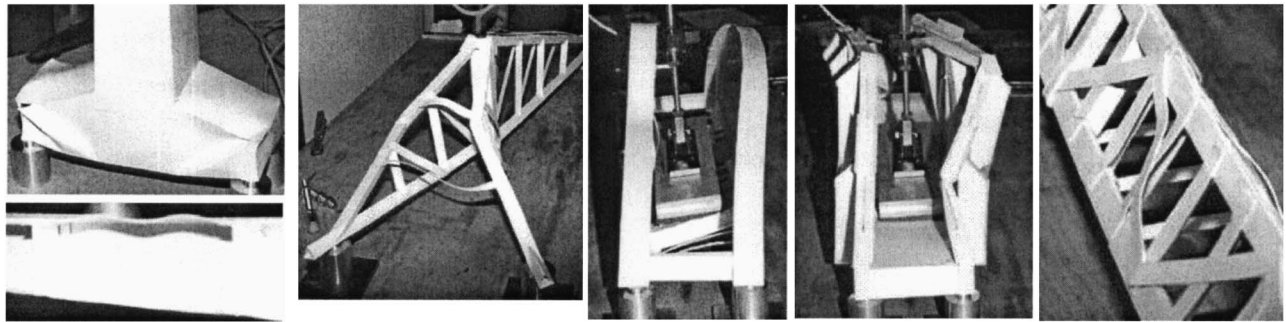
Different failure modes of the models. Plate buckling under shear and compressive stresses, flexural buckling of structural members, lateral torsional buckling of girders of open bridges, flexural buckling of a diagonal in a truss girder (from left to right).
